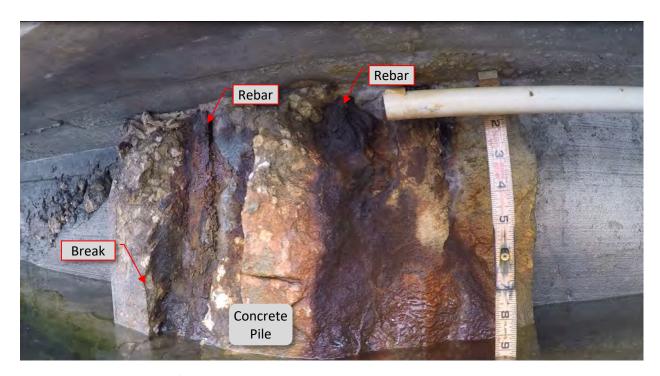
P21. STA 4+12. Break/spall at pile. Loss of concrete and rebar due to corrosion, and rust staining.
